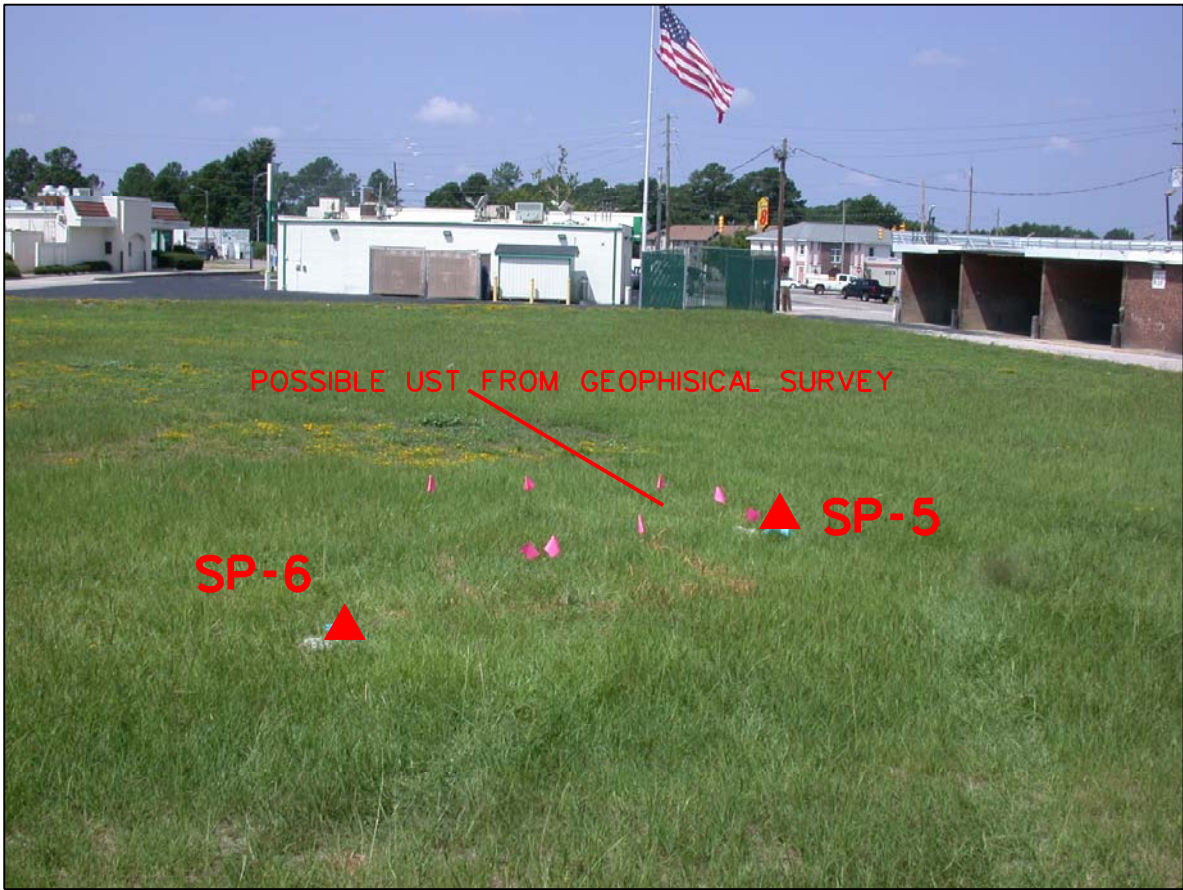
BORINGS WITHIN PROPOSED R/W LOOKING WEST
